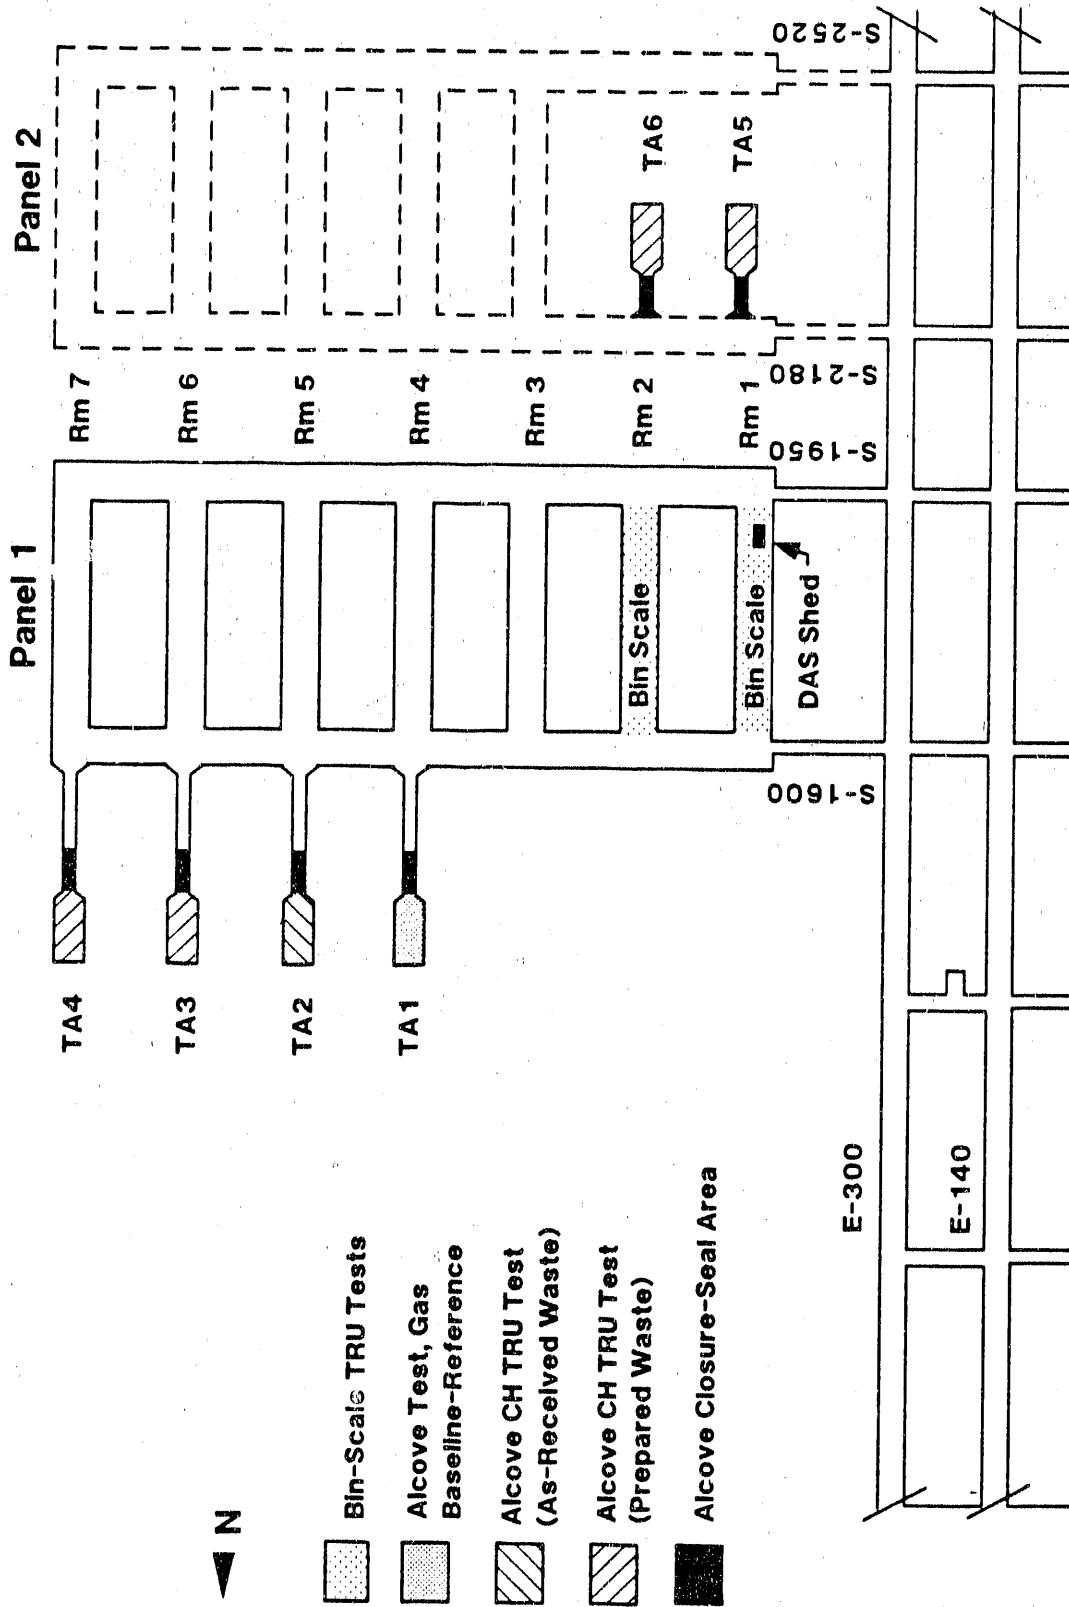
Location of Bin-Scale Test Room, Plan View
